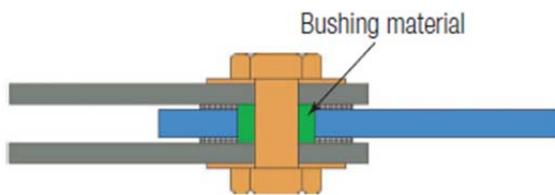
Section and model of bolted connection (Structural use of glass in building)
